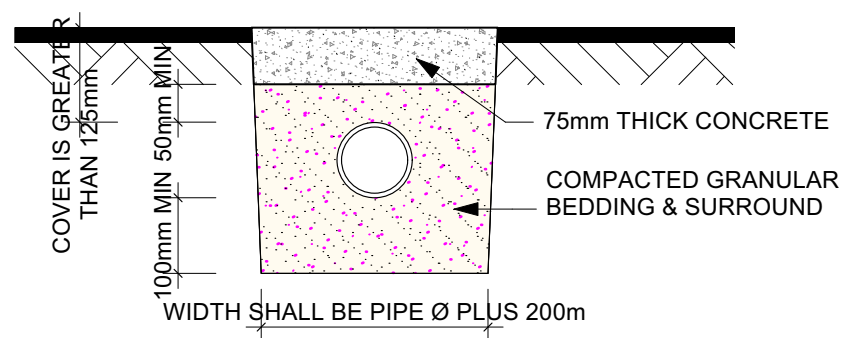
23 VC 851 PIPE PENETRATION DETAIL
